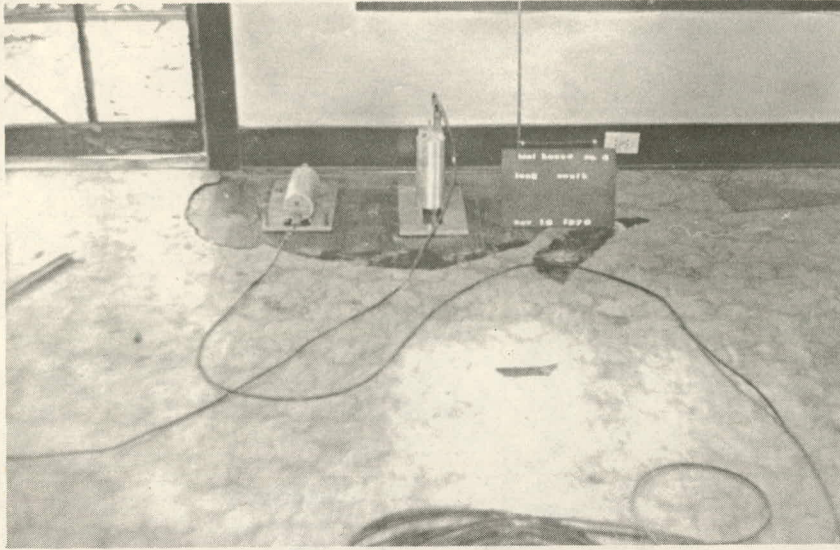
Station #4, Test House #4, seismometer location, north side of house.
